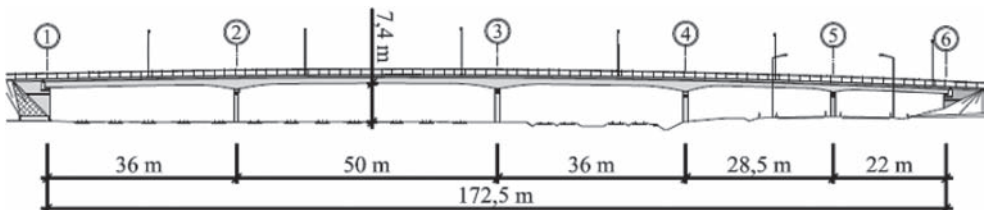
Longitudinal section of multi-span bridge crossing rail tracks and highway.
